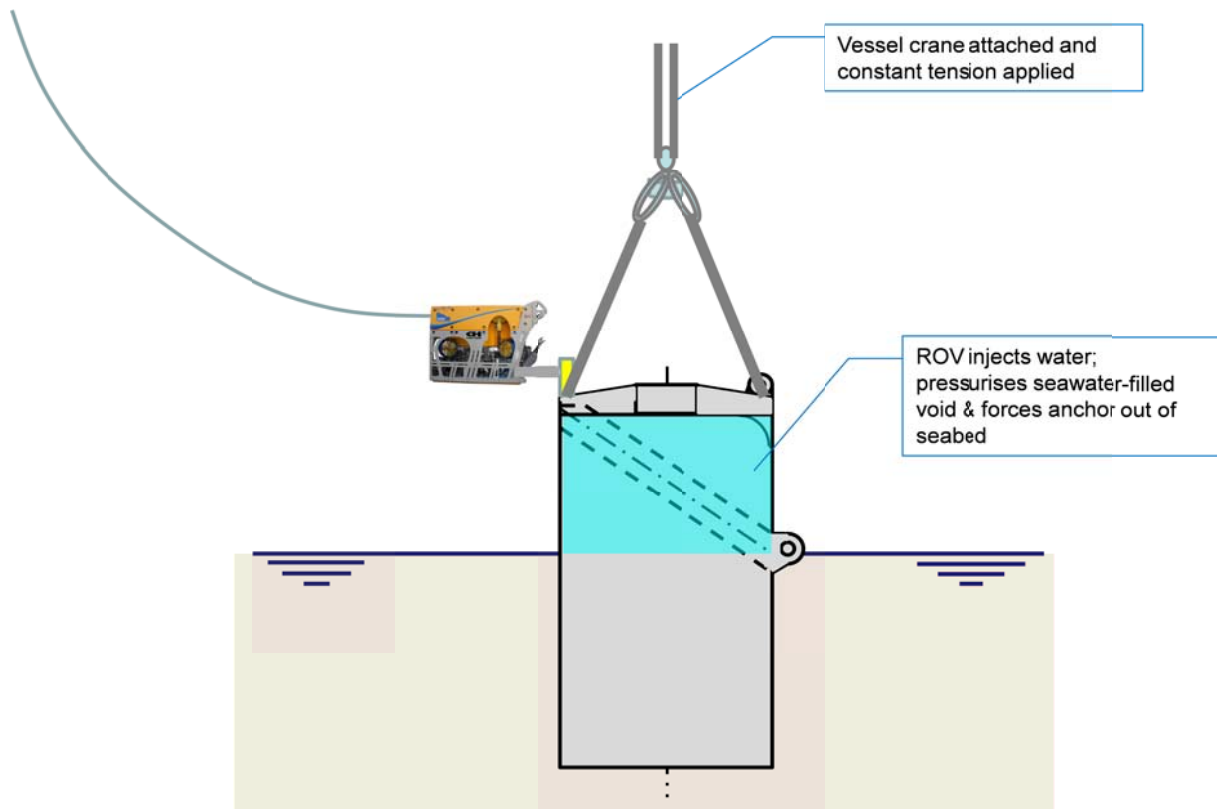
Suction Anchor – Reverse Installation Step 2
